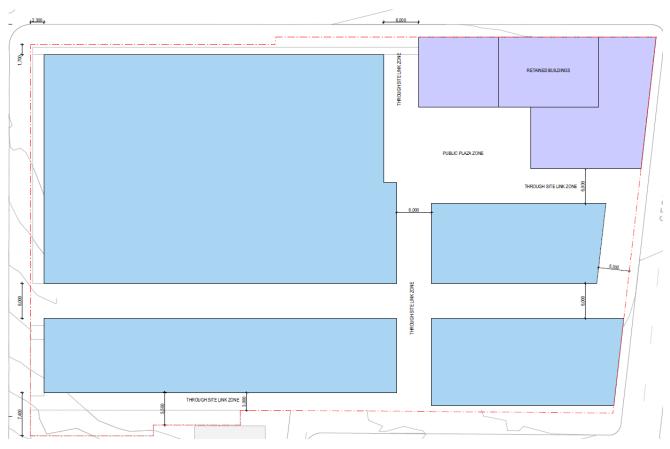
Concept DA building envelopes in ground floor plan (new envelopes in blue and retained character building envelopes in purple)
